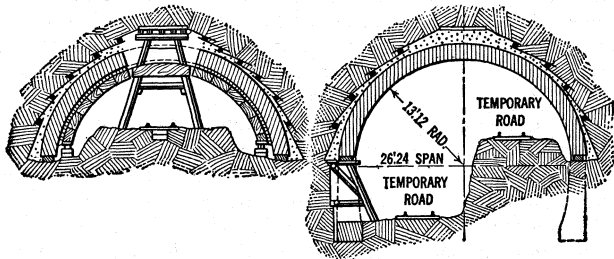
METHOD OF EXCAVATION OF ST. GOTTHARD TUNNEL
